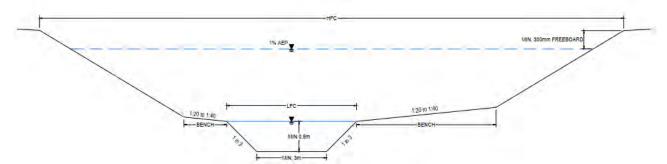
Typical Compound Waterway Cross-section (Melbourne Water's Standard Drawings)
